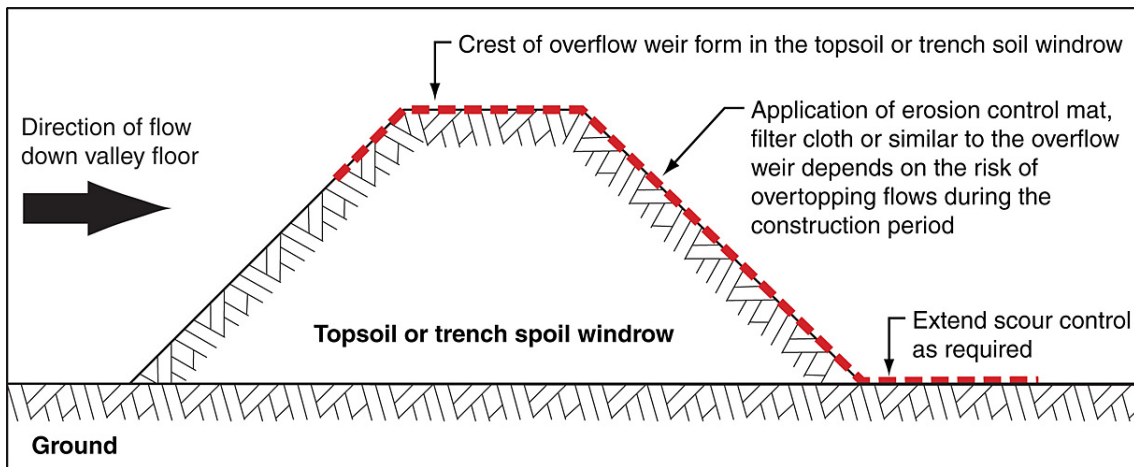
Cross-section of typical overflow weir formed into soil windrow
